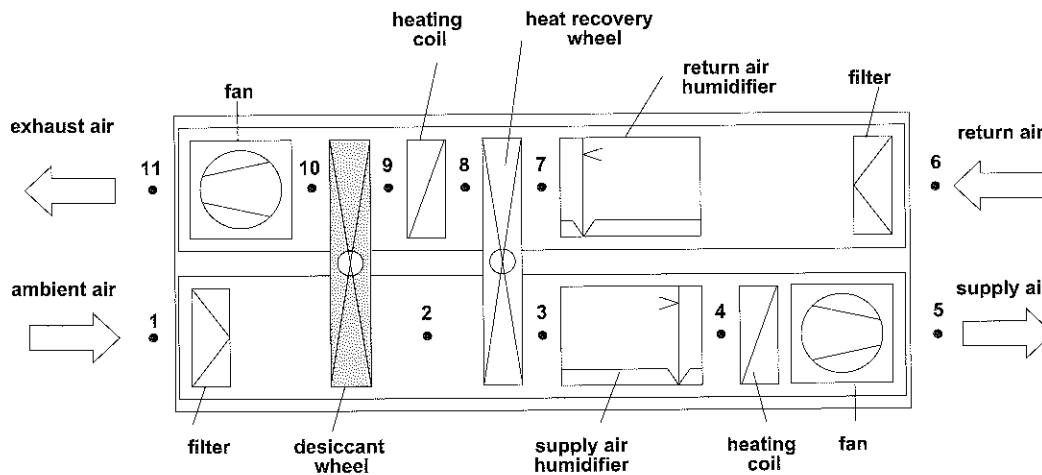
Schematic drawing of a desiccant cooling air-handling unit
